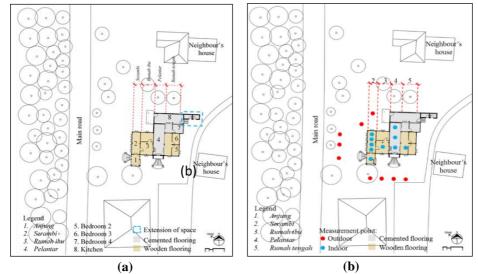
Site plan; the house's spatial division (a), and measurement points inside the house and outdoor area (b)
